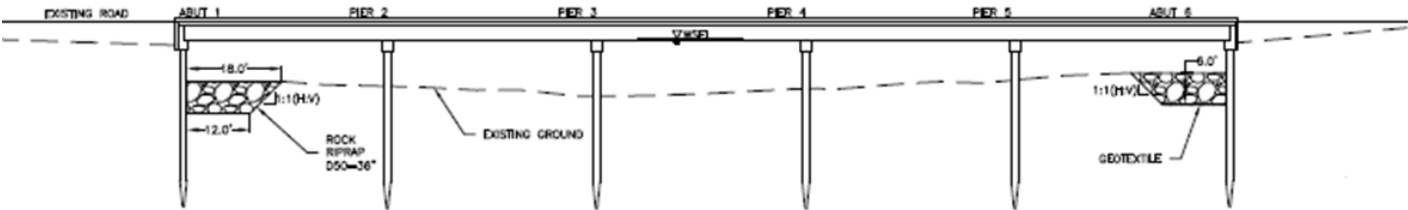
Cross-sectional view of Bridge G-25-D with recommended hydraulic scour countermeasures
